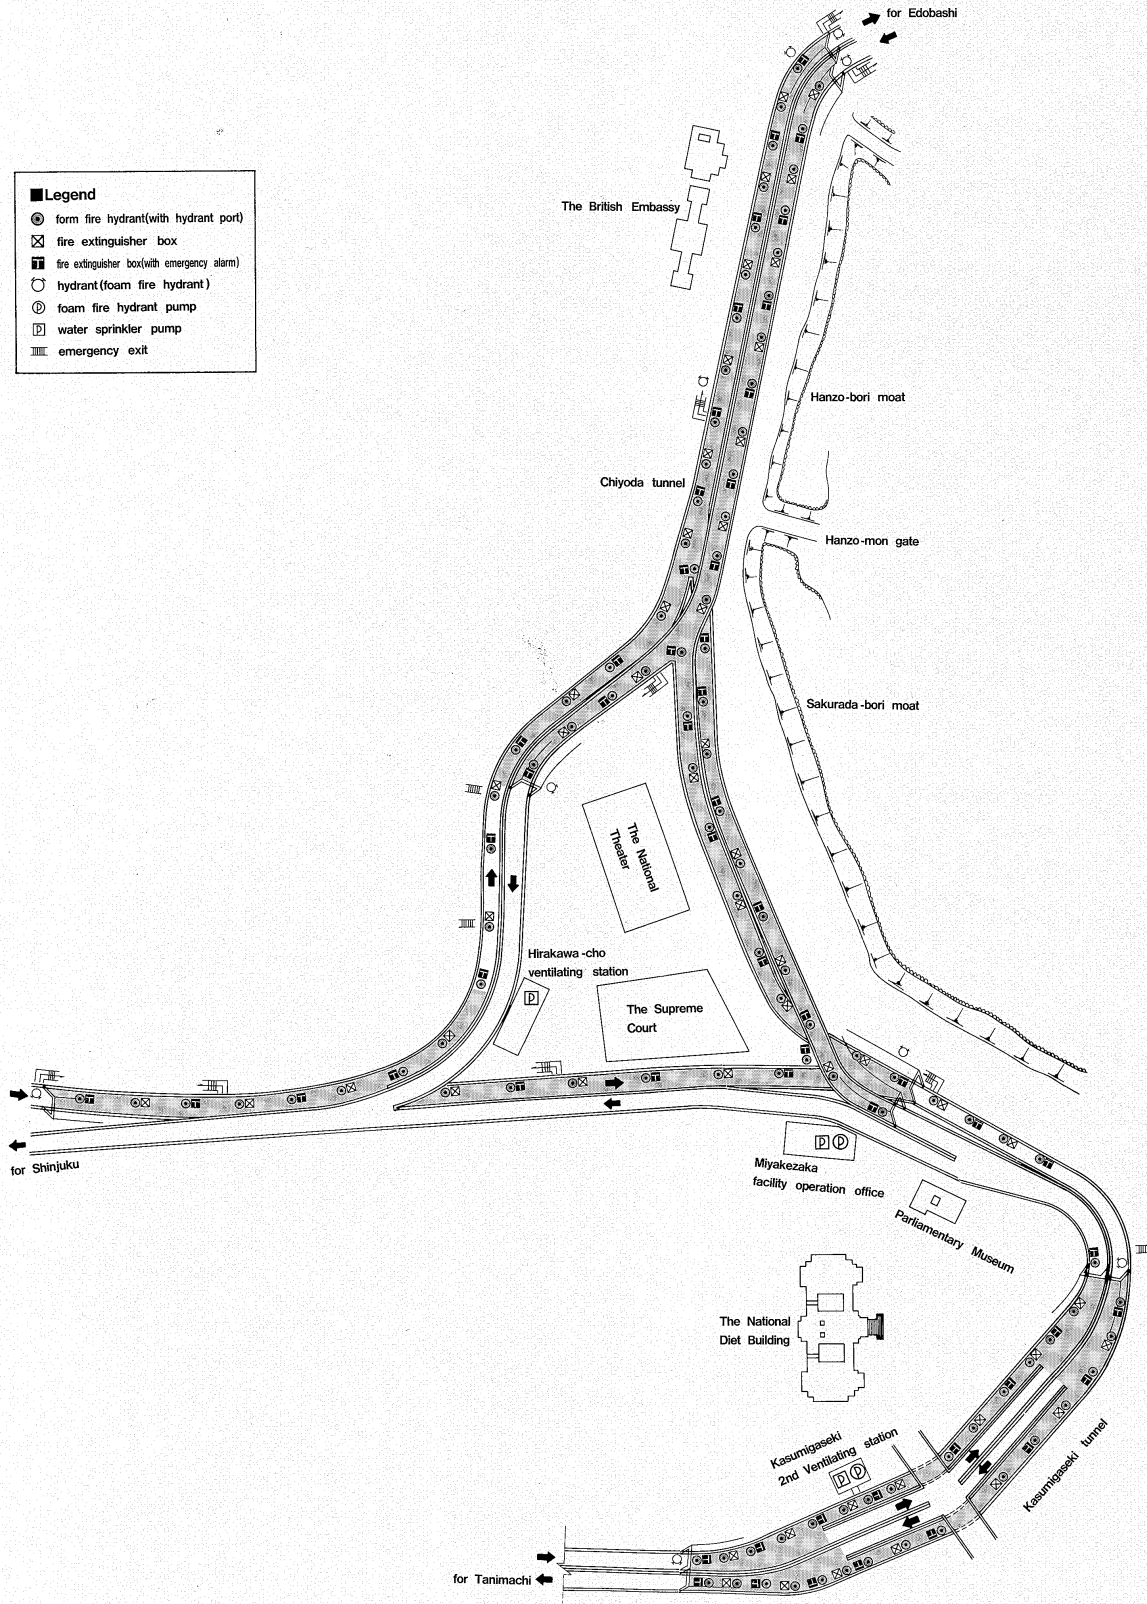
Plan of Chiyoda Tunnel and location of safety facilities
